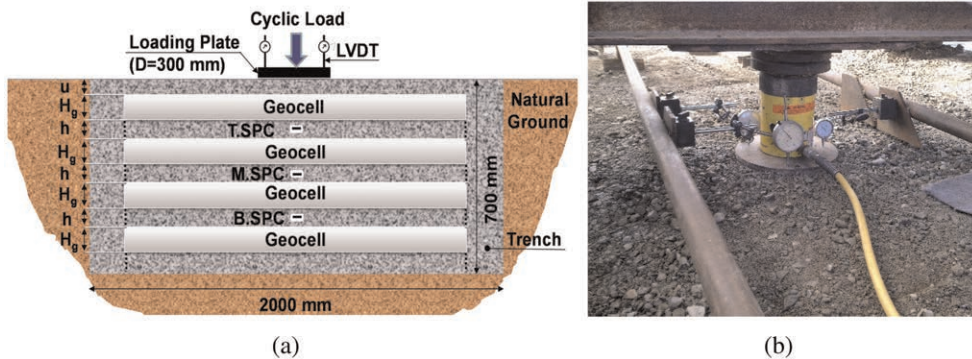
(a) Schematic cross-section of the test set-up (not to scale), “T.SPC”, “M.SPC”, and “B.SPC” indicate the location of soil pressure cells, (b) Photograph of test installation prior to loading include reaction beam, load plate, hydraulic jack and three dial gauges (Moghaddas Tafreshi et al. 2013).
